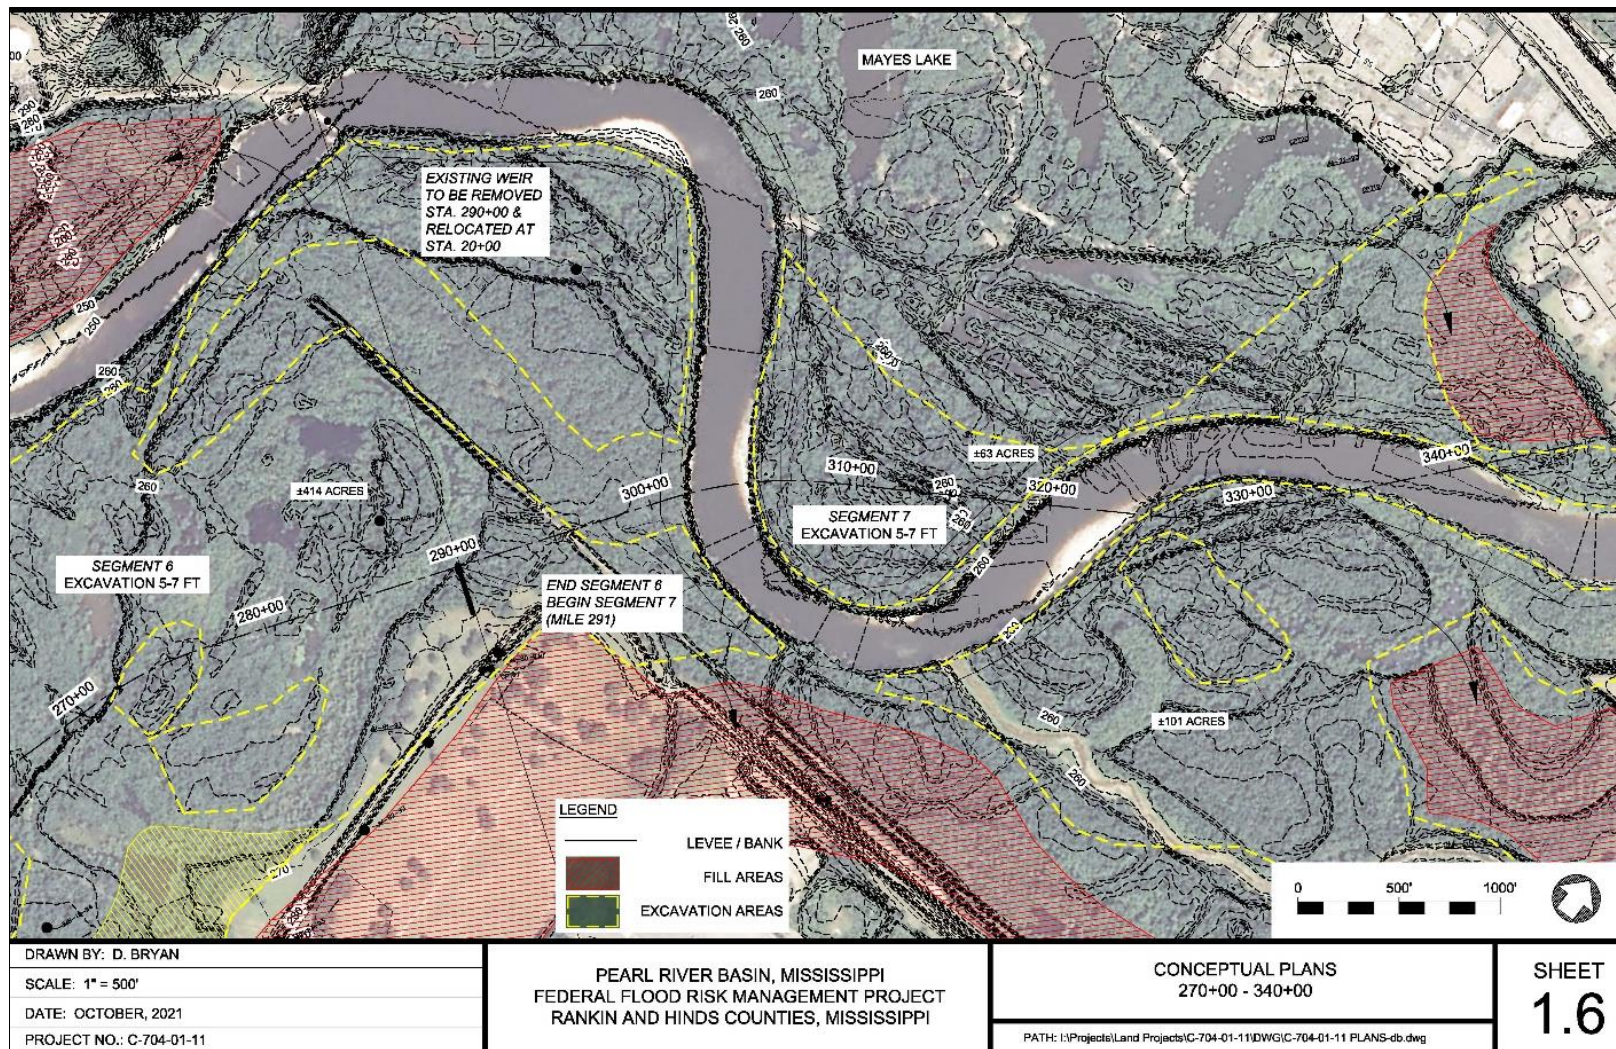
Proposed Excavation Extent for Demolition of the J.H. Fewell Weir
